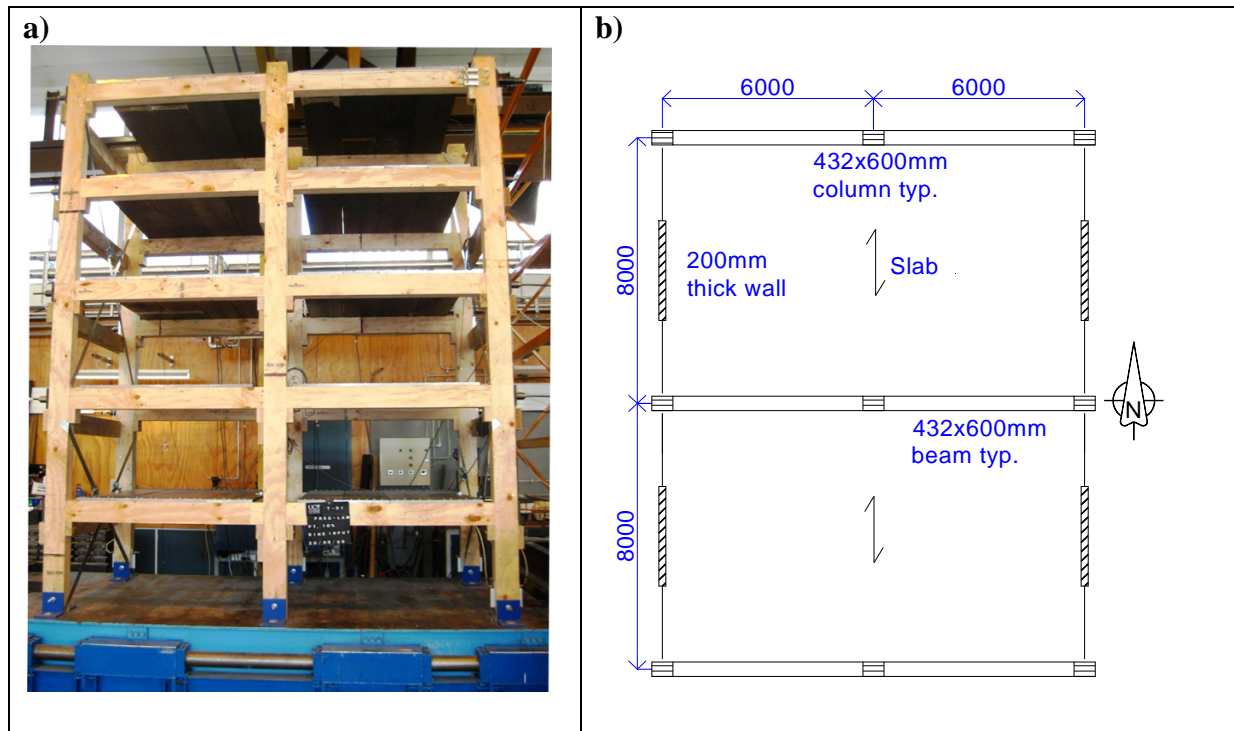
a) 5-storey 1:4 scale model building on shake- table b) Plan section of prototype building
